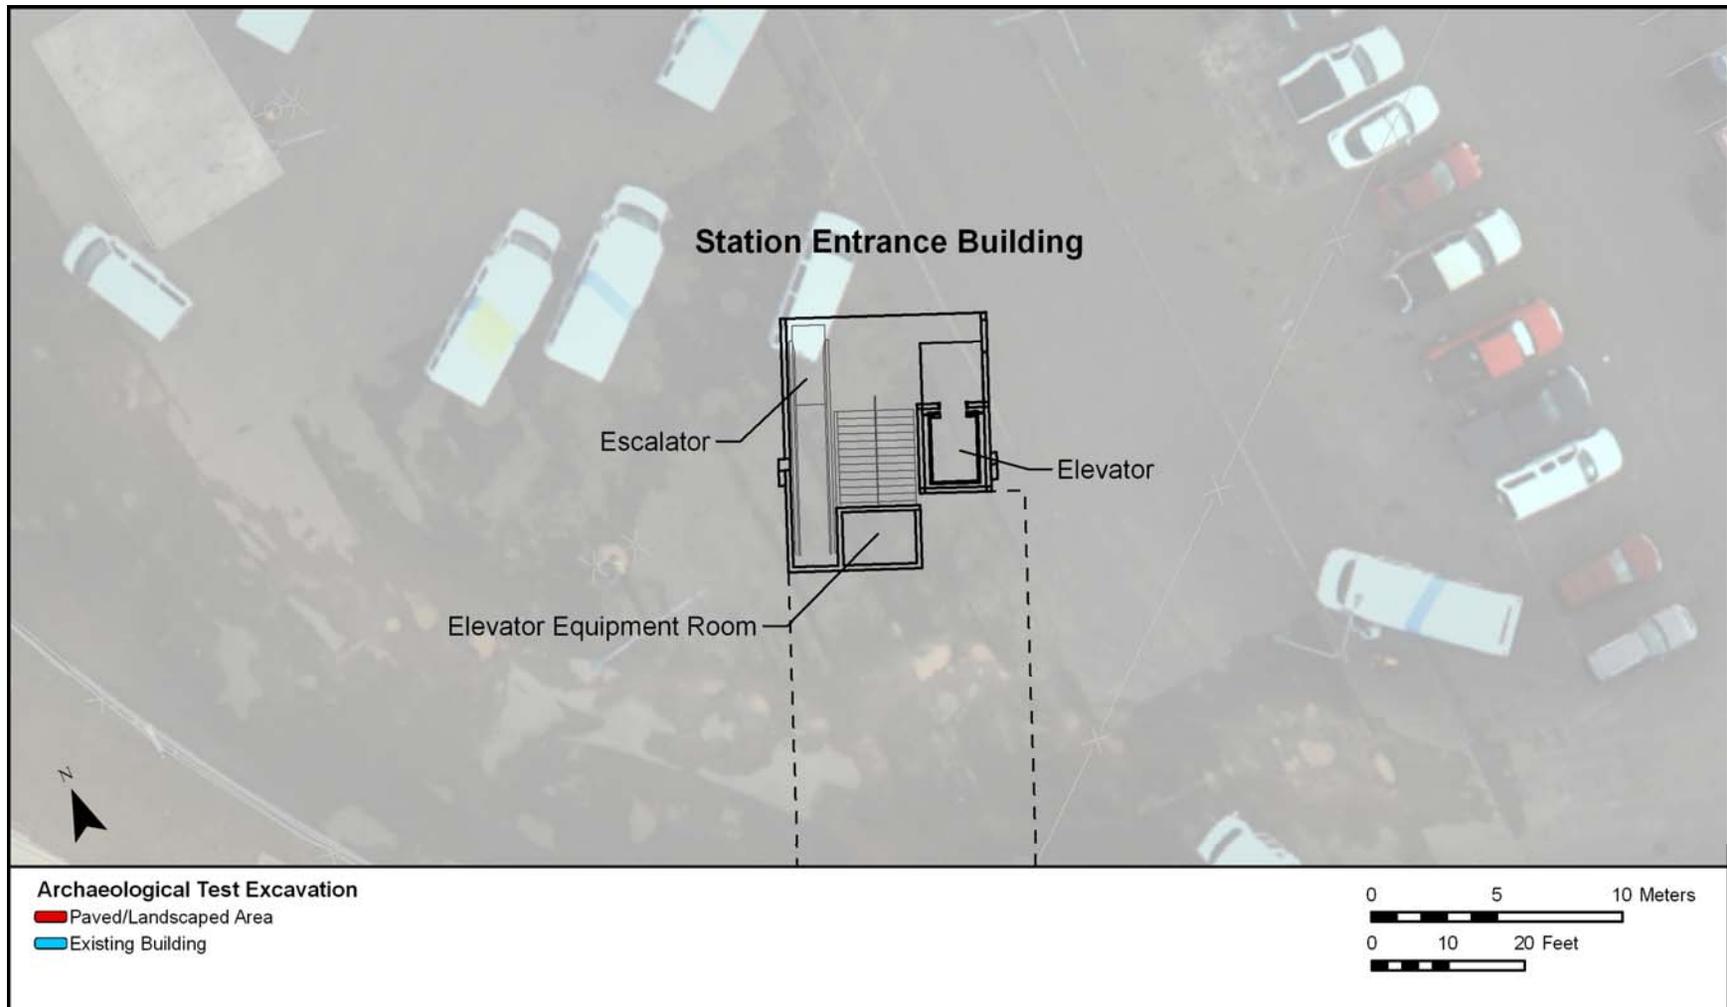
Middle Street Transit Center Station, detail of (*mauka*) Station Entrance Building (no test trenches at *mauka* Station Entrance Building due to prior soil remediation work)
